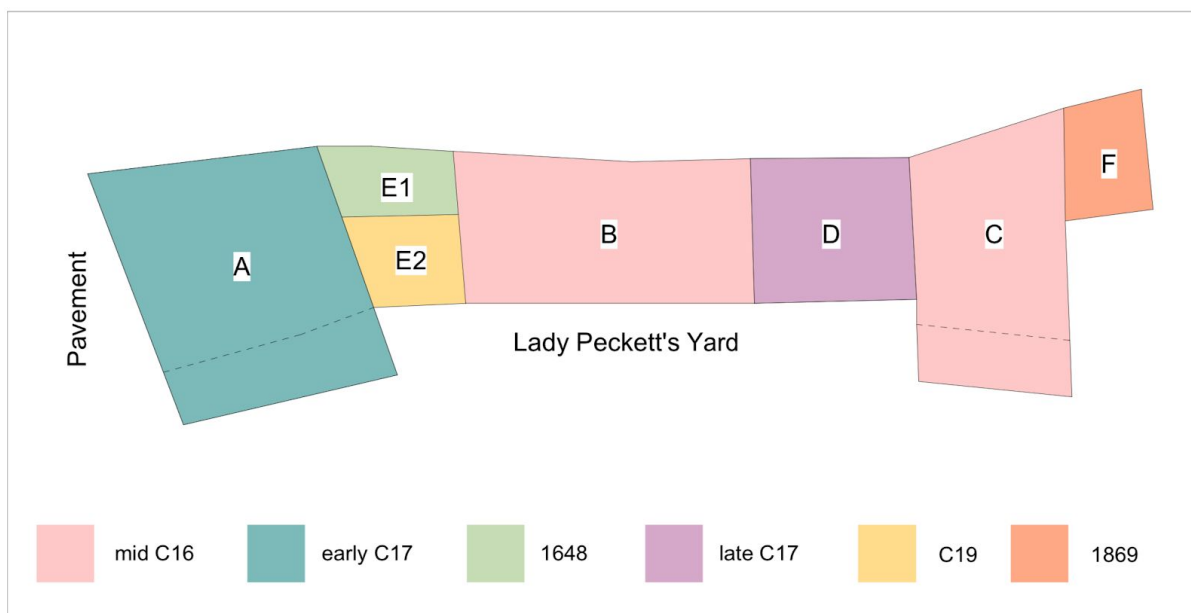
Labelled & phased block plan of Herbert House and Lady Peckett's Yard.
